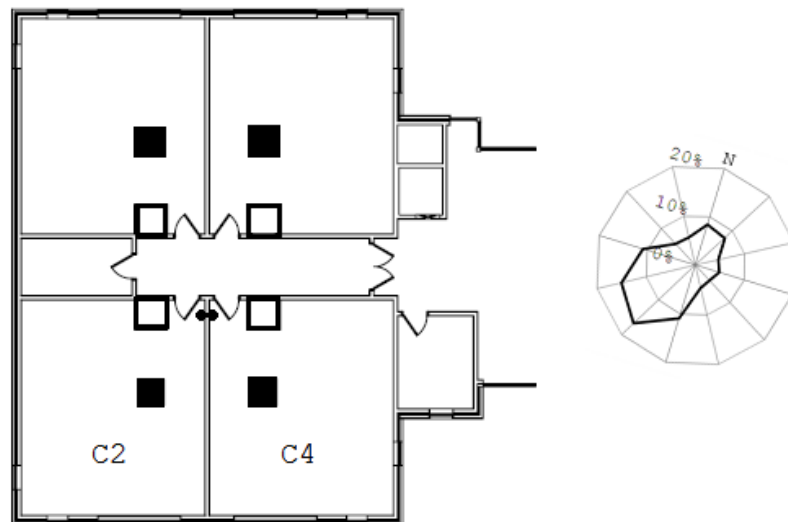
School C, plan view, first floor. C2 and C4, floor area 57.05 m².
